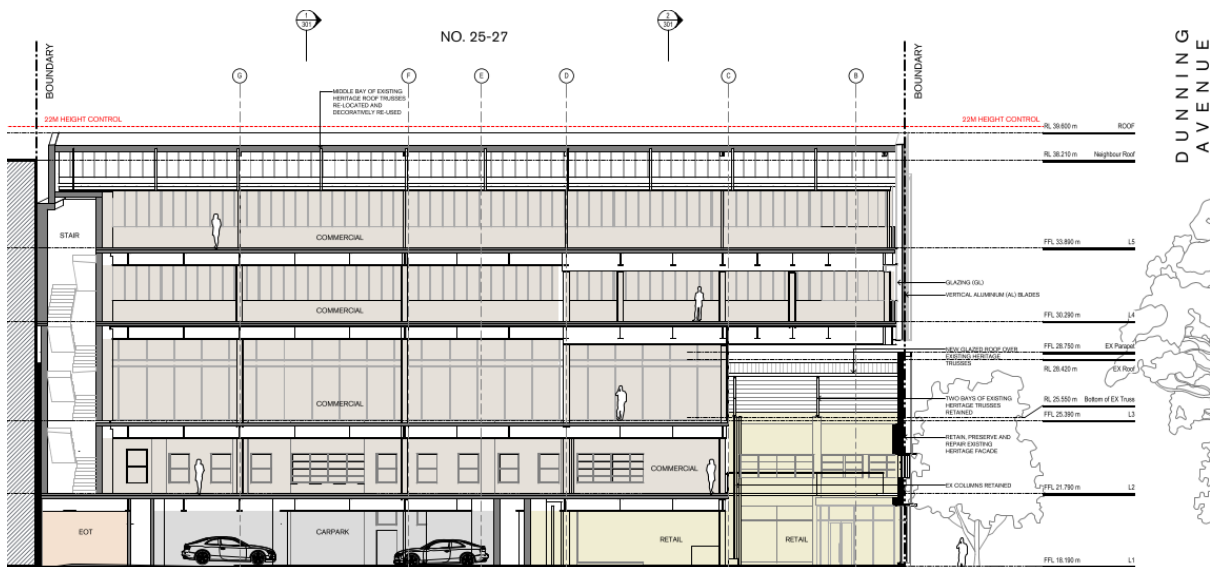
Proposed Section Plan 1 looking from north to south through the building
